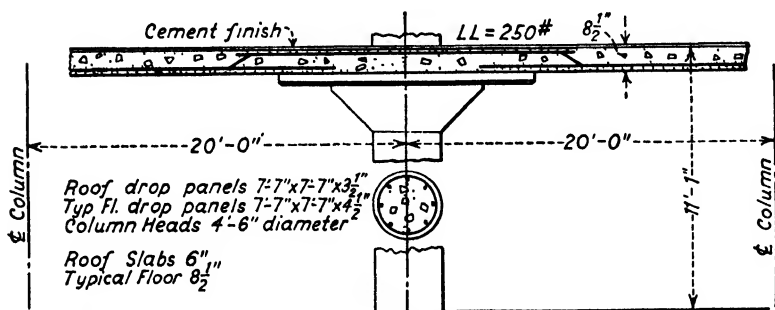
Type 3. Flat Slab Floor for 8-Story Warehouse. (See p. 786.)
